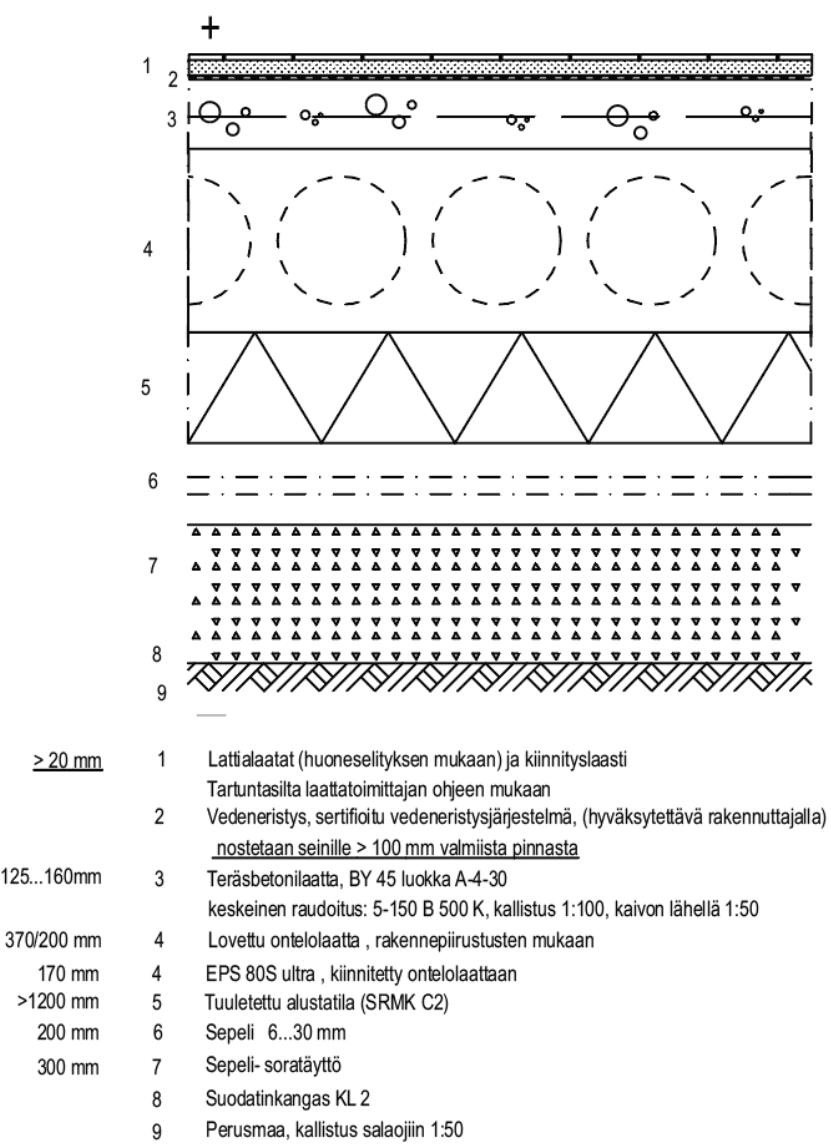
Wall and floor types used in Base project, by architects firm ARK-HOUSE ARKKITEHDIT OY, source Hannu Huttunen
